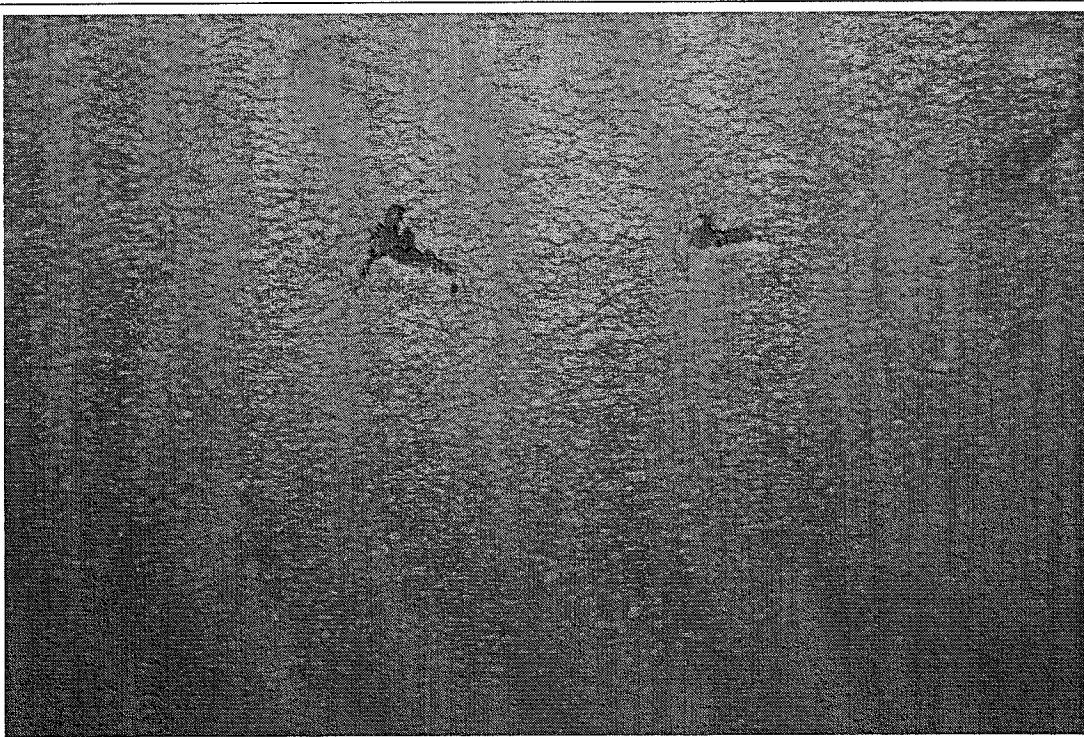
B Floor - east hallway - Close-up of damaged acoustical plaster in hallway
